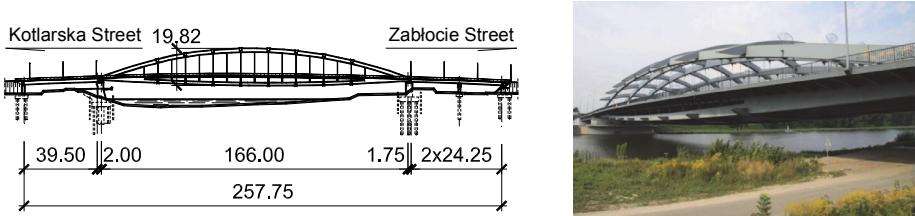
Side view and overall view of the Kotlarski Bridge in Cracow
